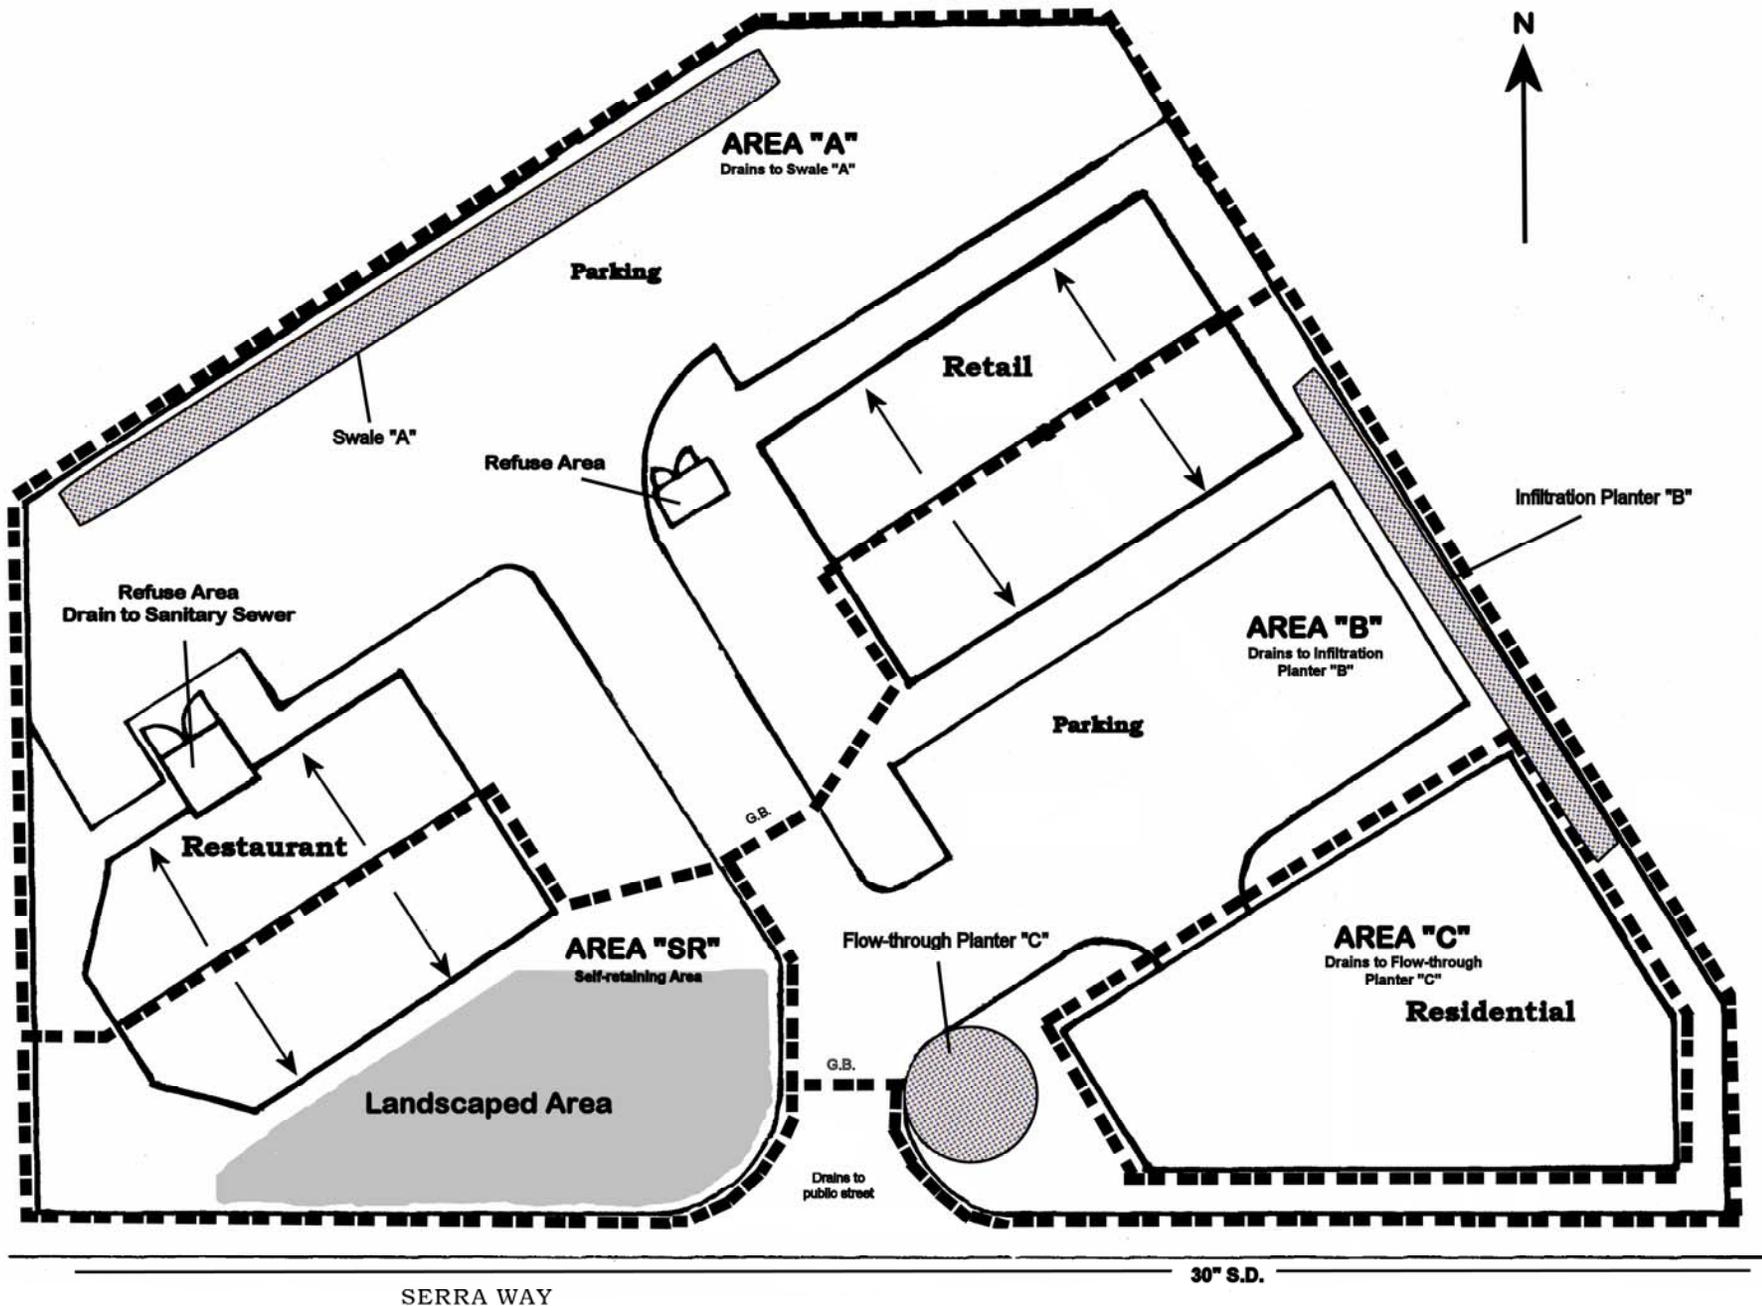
BMP Exhibit Example Stormwater Control Plan for 70 Serra Way
